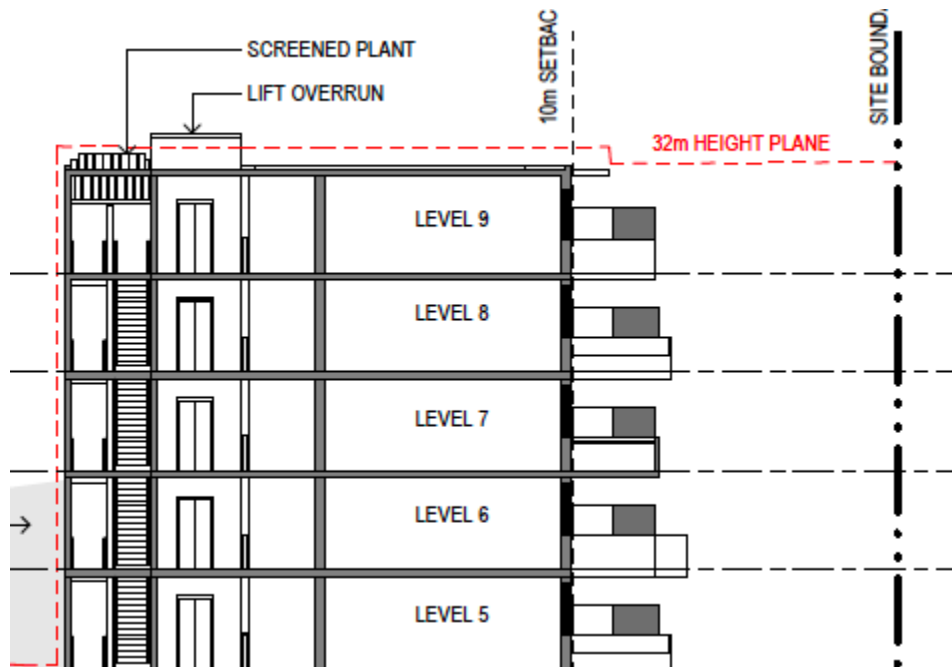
Section along the eastern elevation which shows lift overrun which breaches the building height development control.
